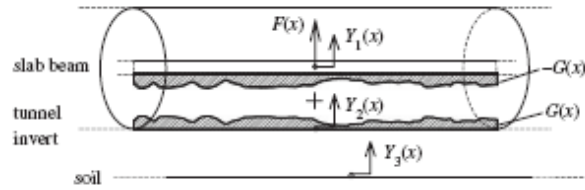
Joining an infinitely long slab beam to the tunnel and the interaction forces [25]
